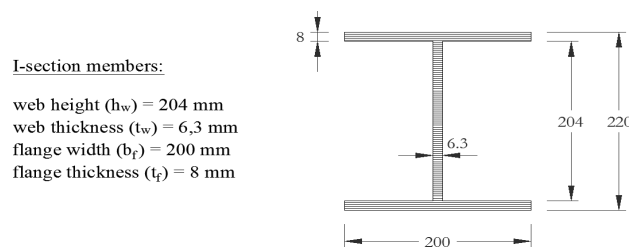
Steel cross section of columns and beams used by De Grandi [14]. Source: De Grandi [14]
